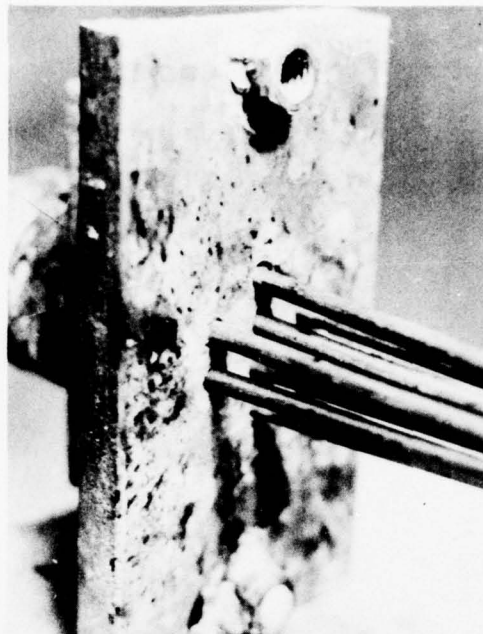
Inside face of the seaward anchorage of beam 13 exhibiting tarnishing and pitting
